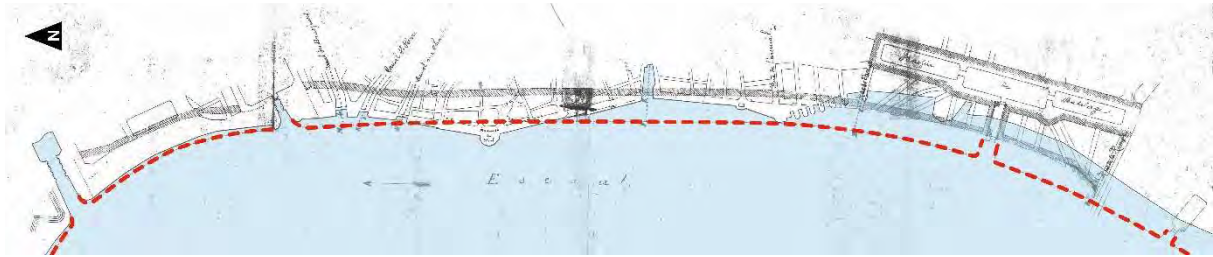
Location of the new quay walls (red line) w.r.t. the original river banks at the end of the 19th century (based on the original construction plans).
